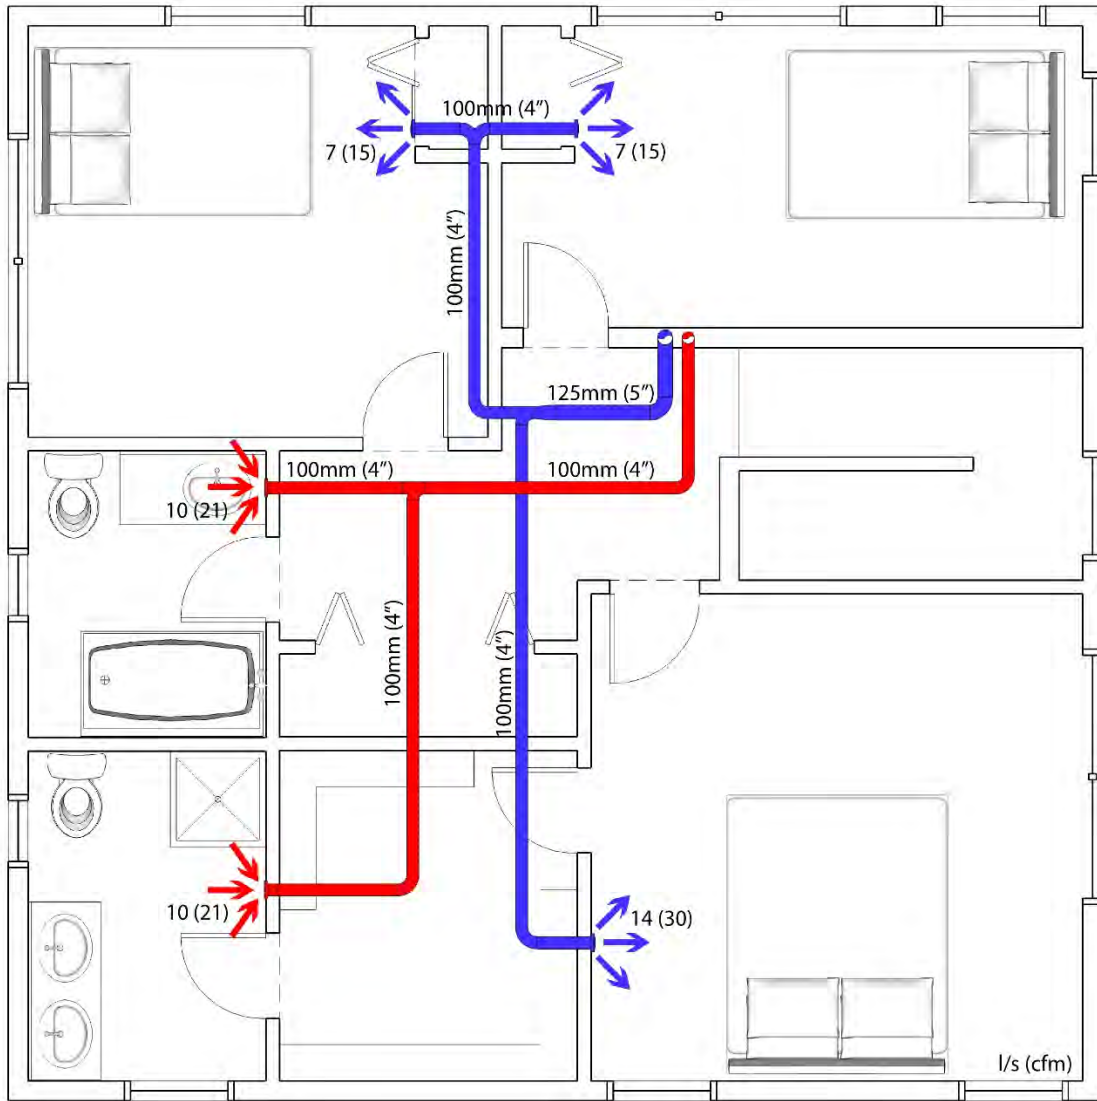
Fig D: Example schematic HRV / ERV trunk & branch ducting system layout, upper floor
